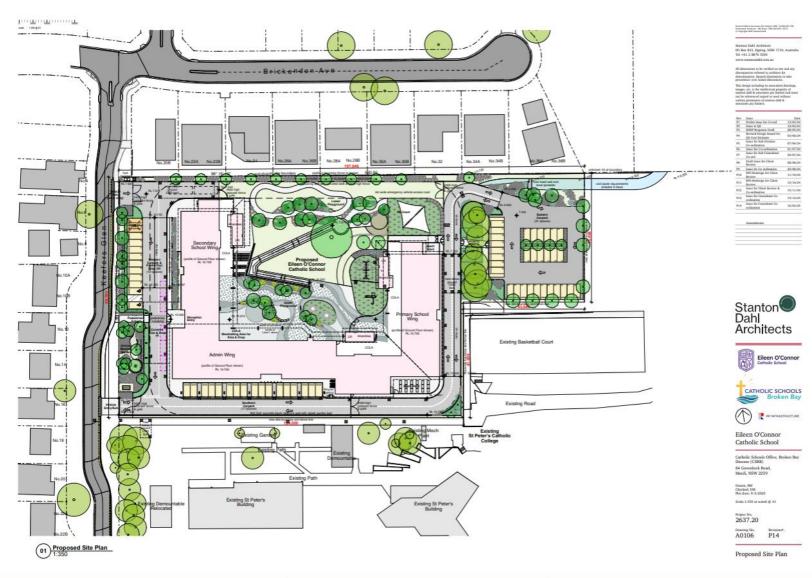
Plan view of approved development layout (Source: Stanton Dahl Architects March 2025)
